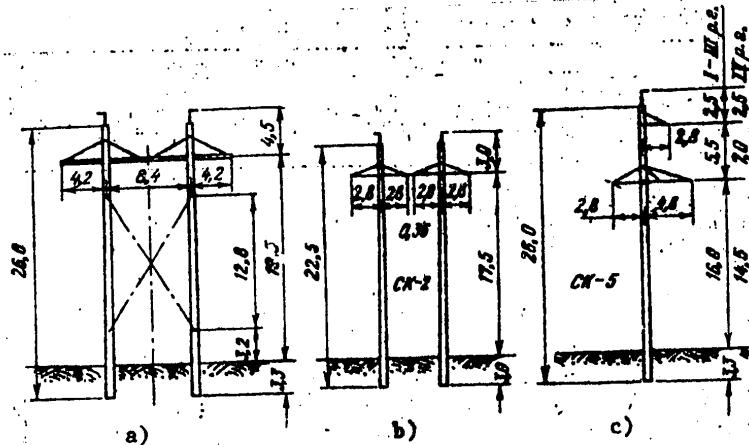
Standardized 220 and 330-kV Reinforced-concrete Towers
